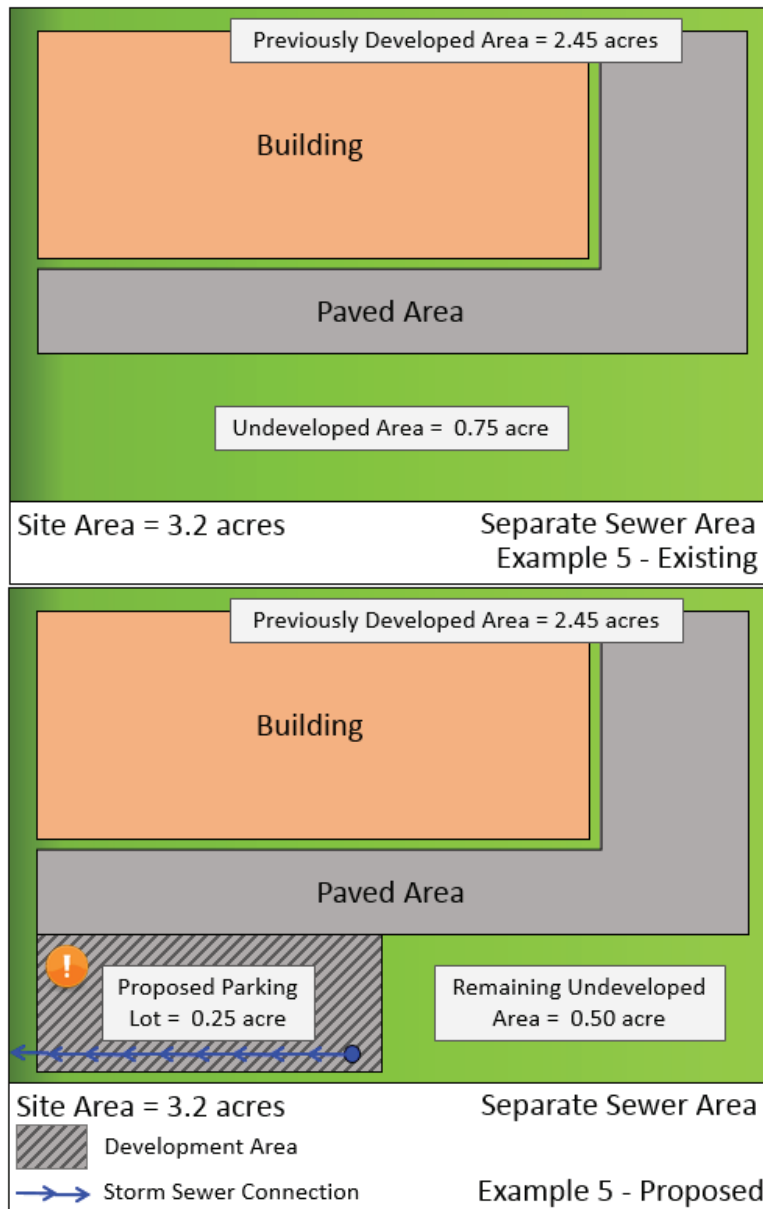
Permit Applicability Example 4 – Existing and Proposed Conditions
